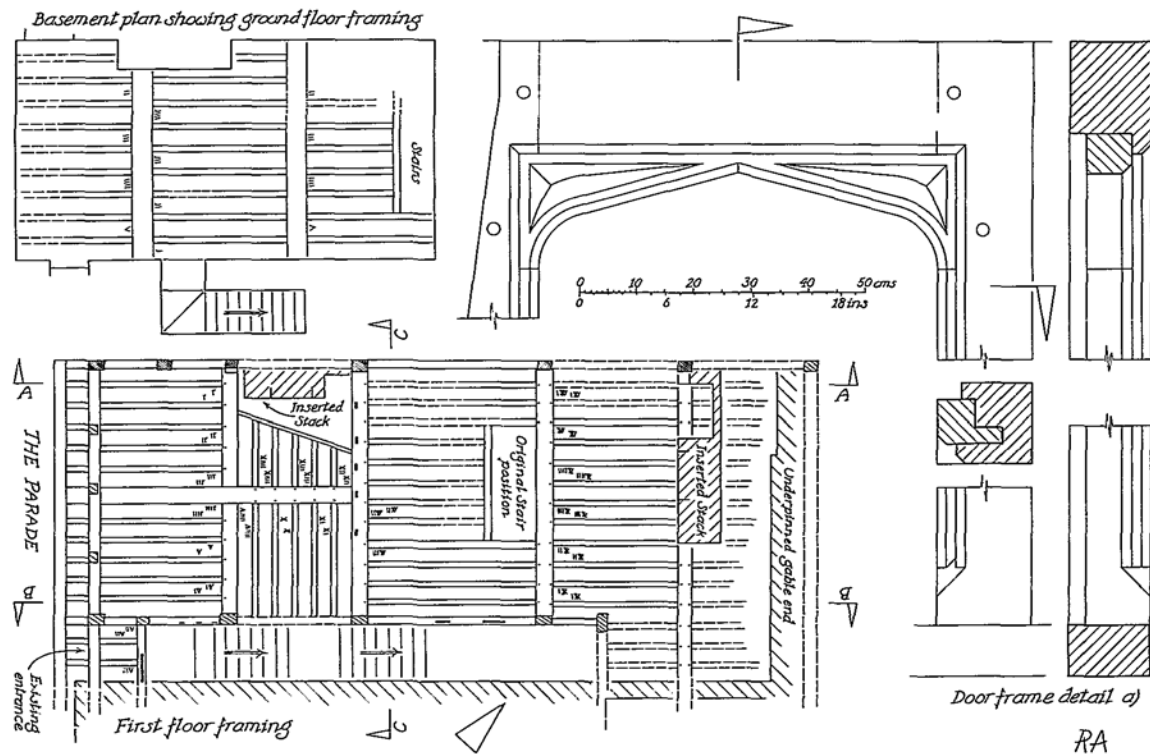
No. 3 The Parade, Canterbury: First floor framing, cellar plan and door frame detail.
